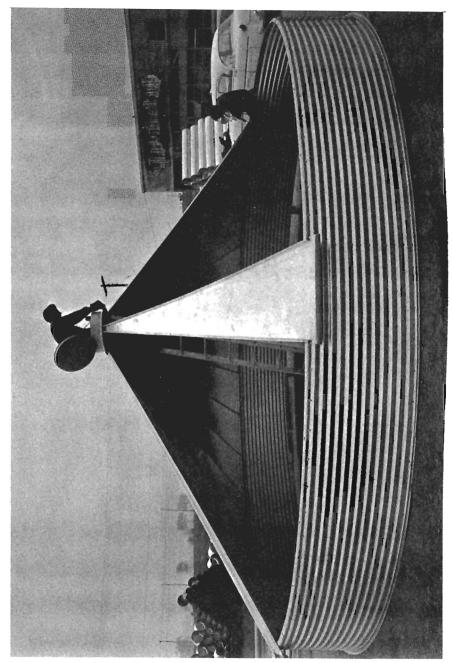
Common Hole Pattern Reduces Tool, Set-Up and Manufacturing Cost
